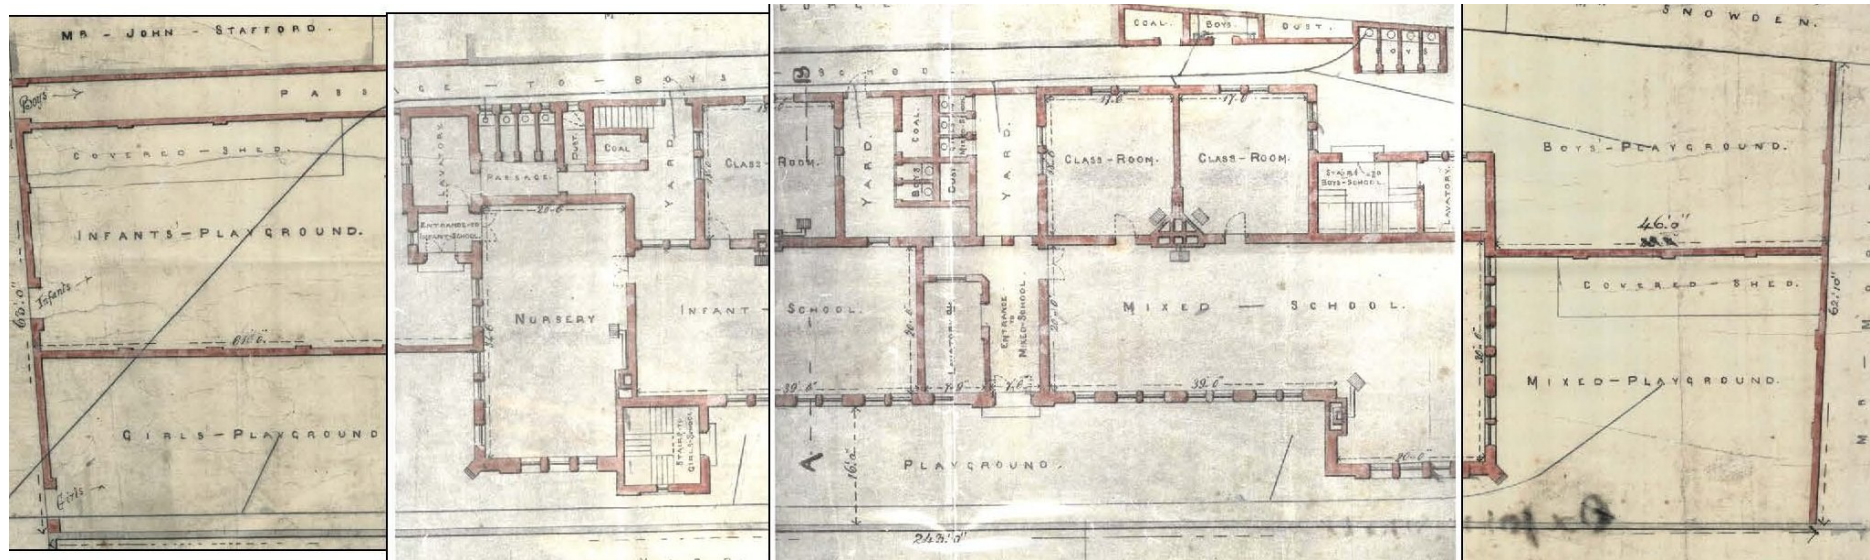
Composite image showing architect's original ground floor plan of Oxford Street School. (LBR Plan 1873/2703. Not to scale).
